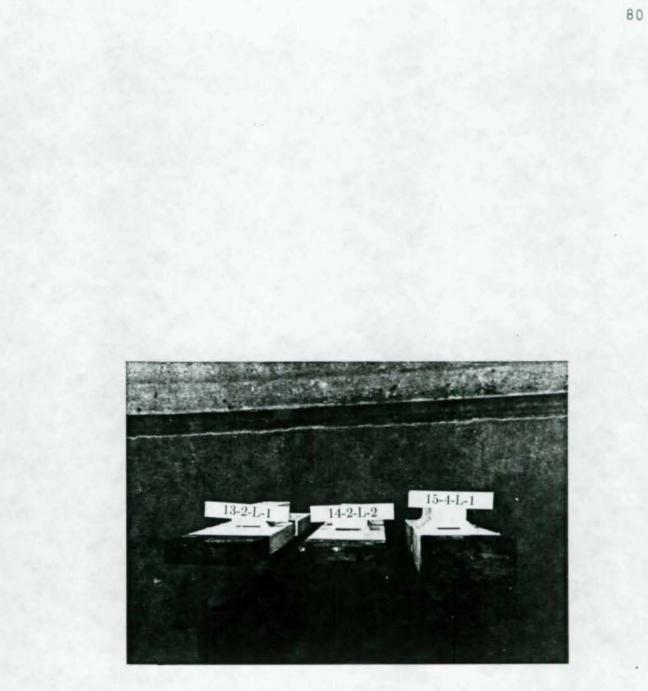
Photograph of Longitudinal Specimens with Fabrication Gaps
